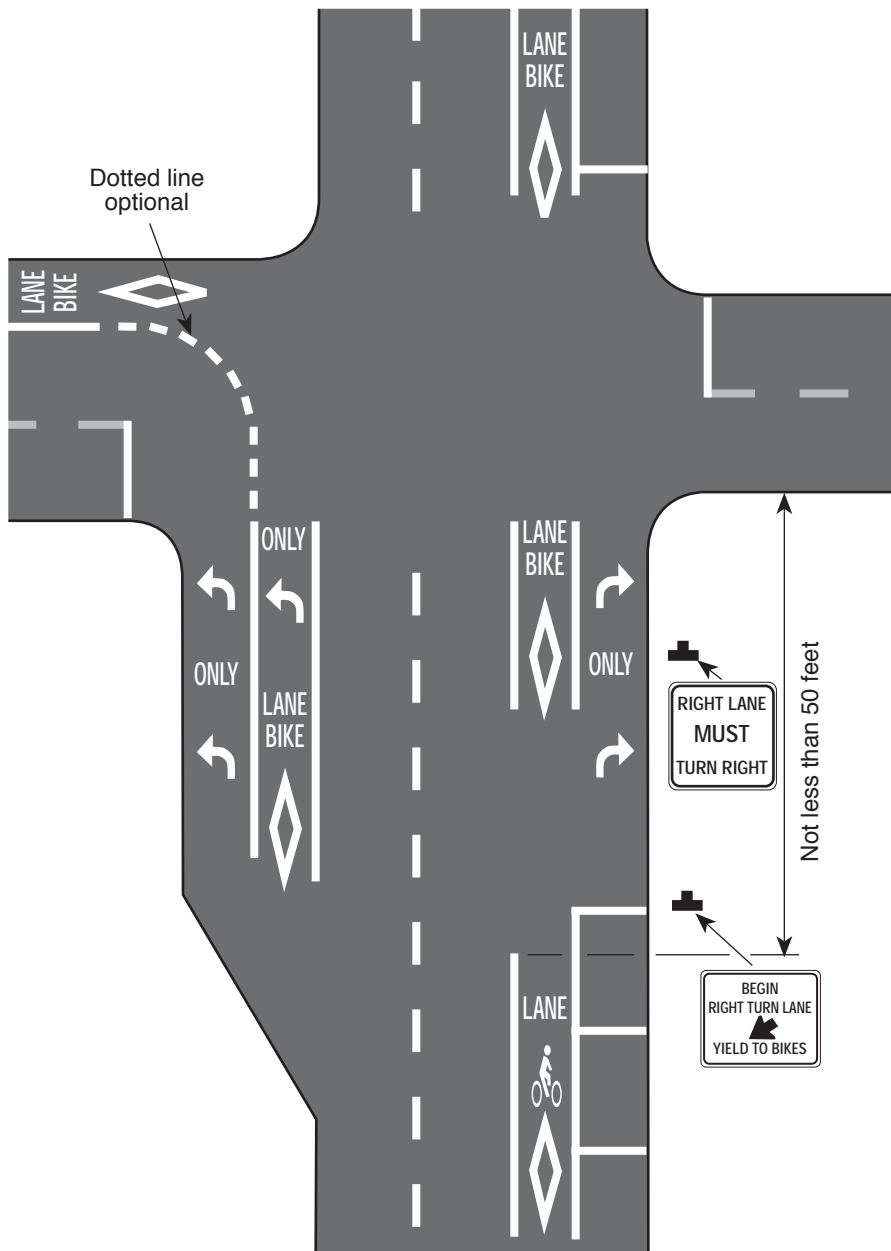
Intersection pavement markings — designated bicycle lane with left turn area, heavy turn volumes, parking, one-way traffic or divided roadway.
